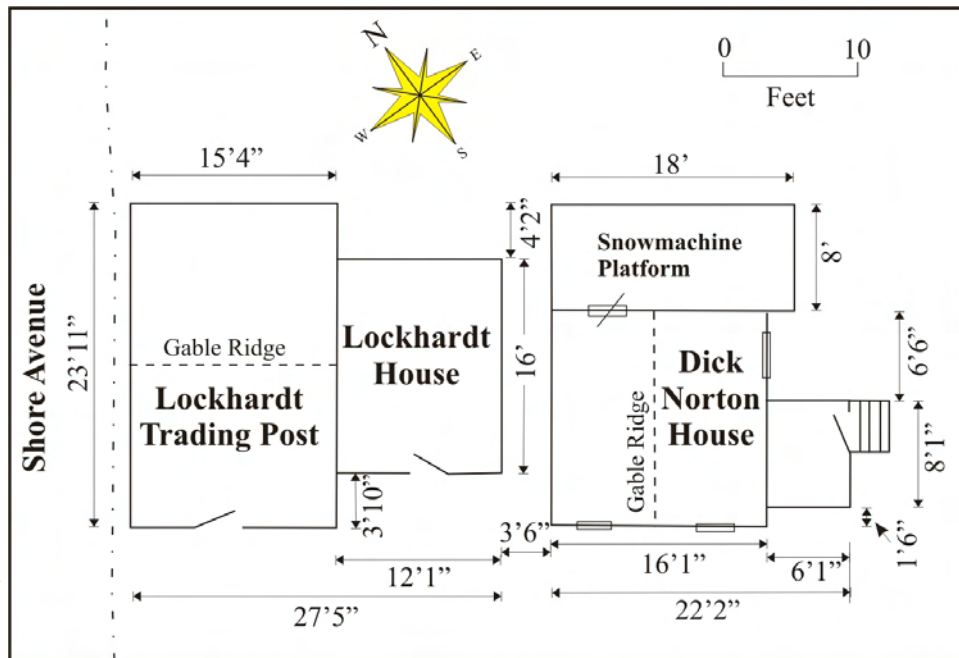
Plan of the Lockhardt Trading Post, Lockhardt House, and the Dick Norton House at 715A, 715C, and 715B Shore Avenue.
